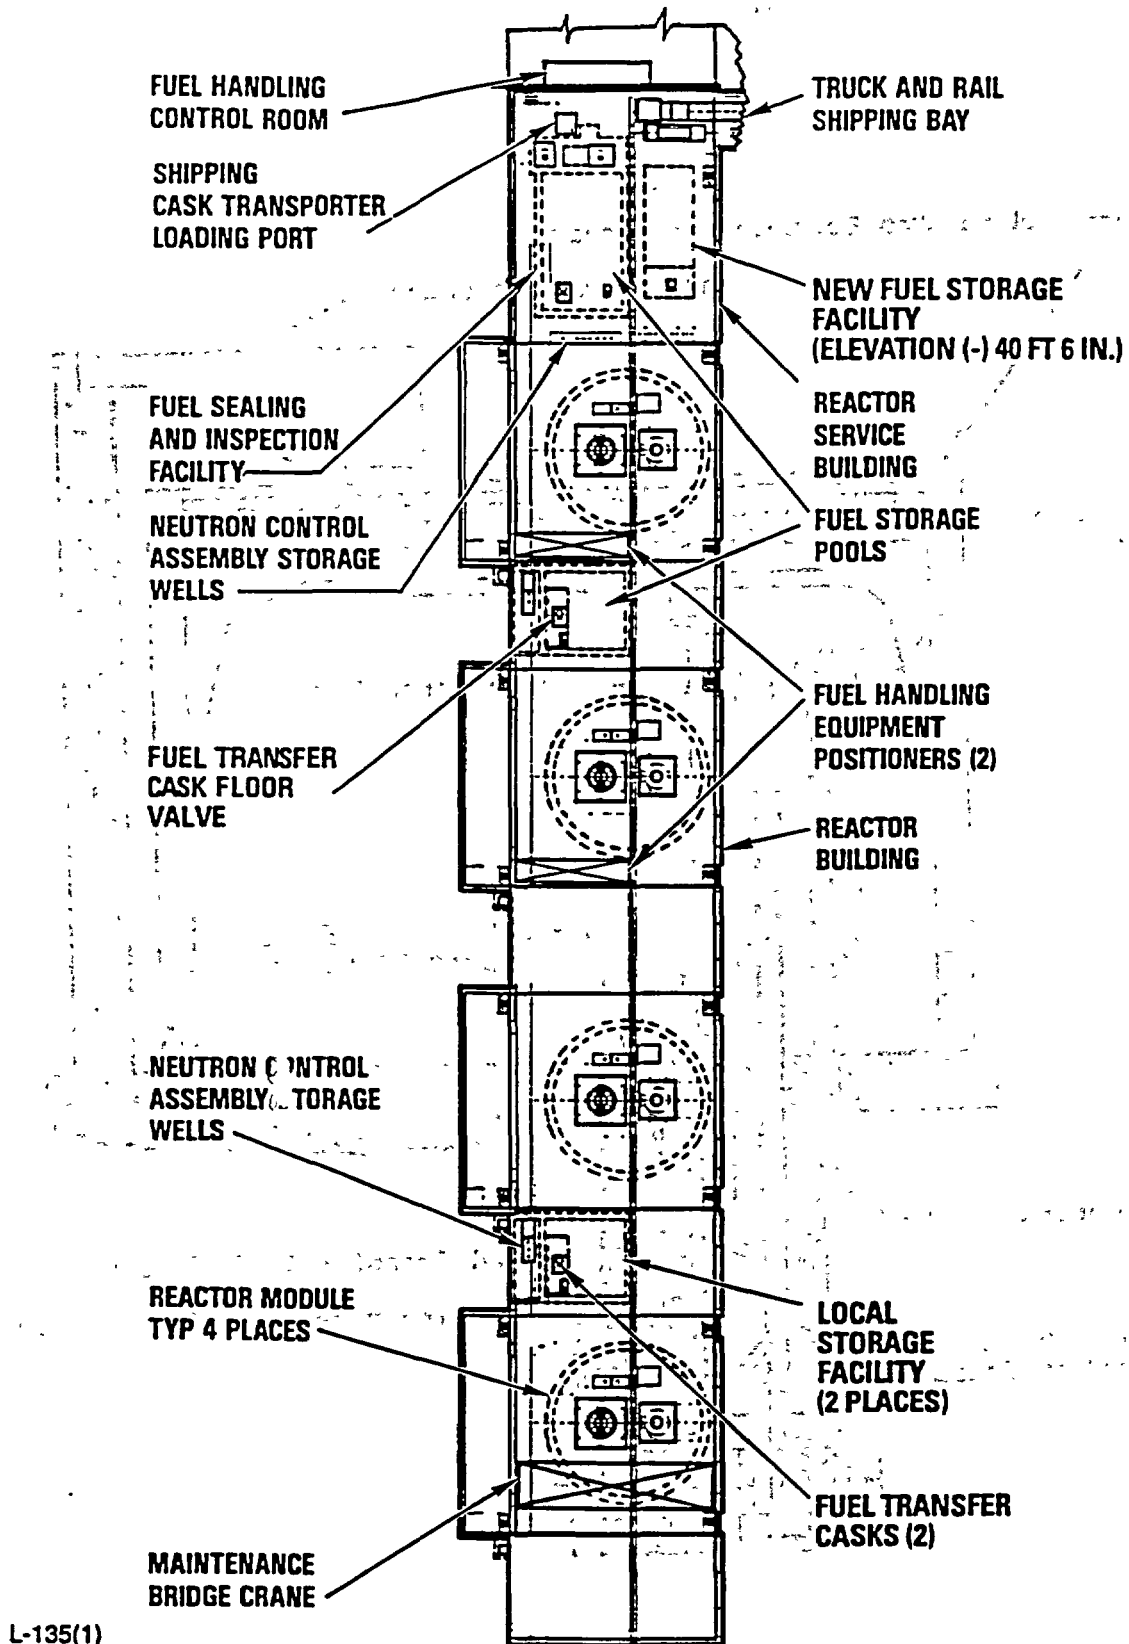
Fuel Handling and Storage System plant arrangement
